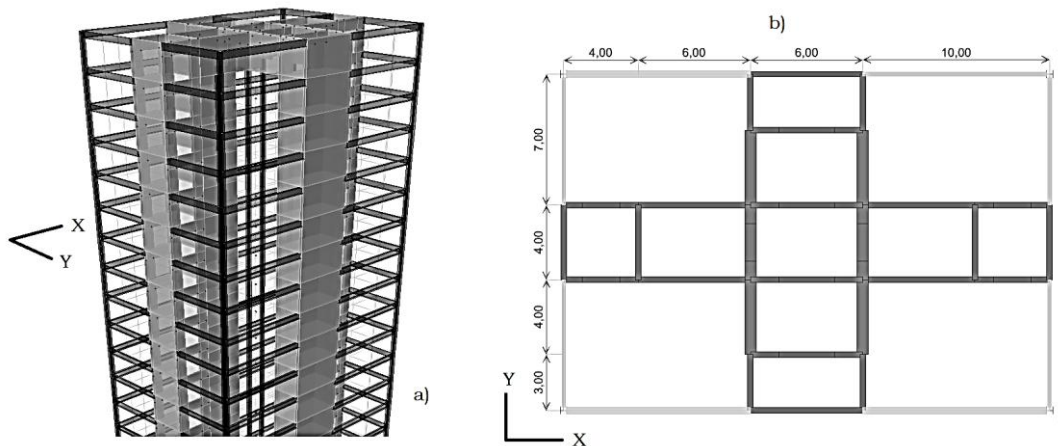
Tubed mega frame model. a) 3D b) Plan
